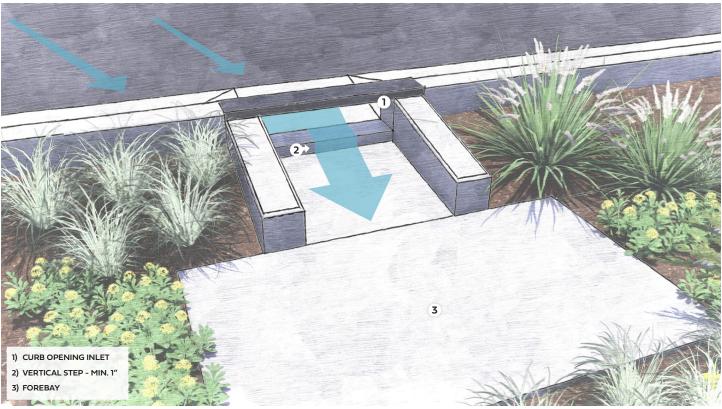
CURB OPENING INLET INTO STREETSIDE BIORETENTION AREA
